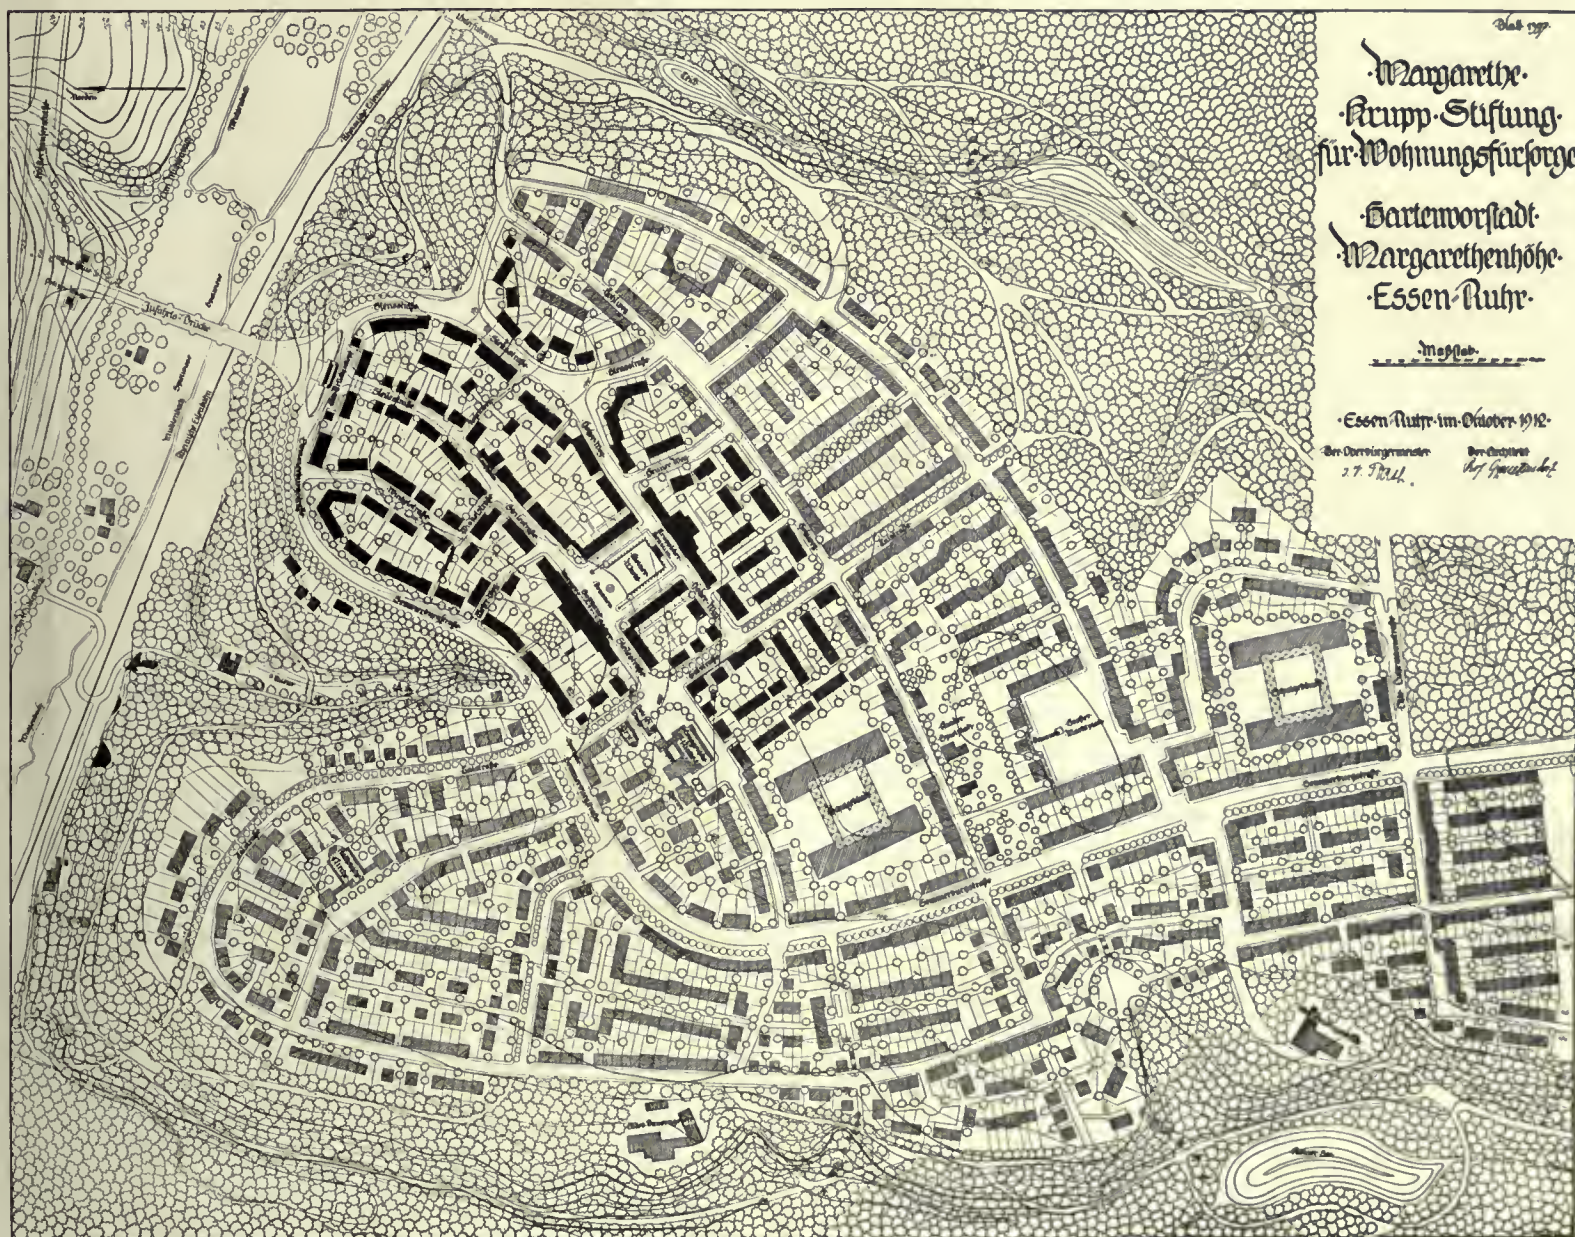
Plan of the Suburb showing Arrangement as Laid Out and Constructed up to October, 1912
